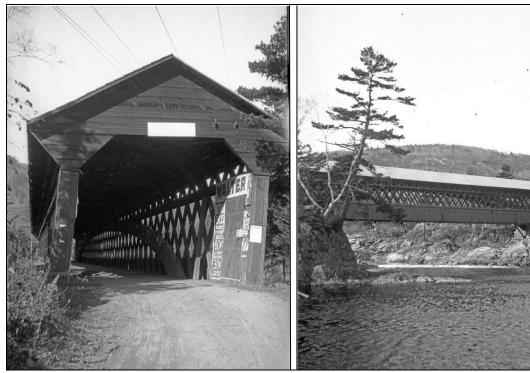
Stevens Village Bridge, built 1875. New Hampshire portal, October 31, 1922 (Storrs).
